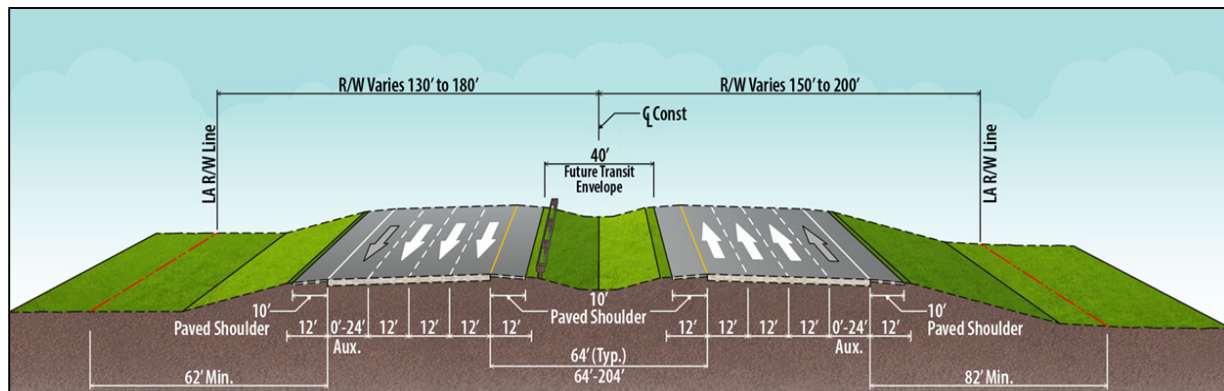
I-275 Mainline Build Alternative Typical Section from I-175 to south of Gandy Boulevard (Segment B)
